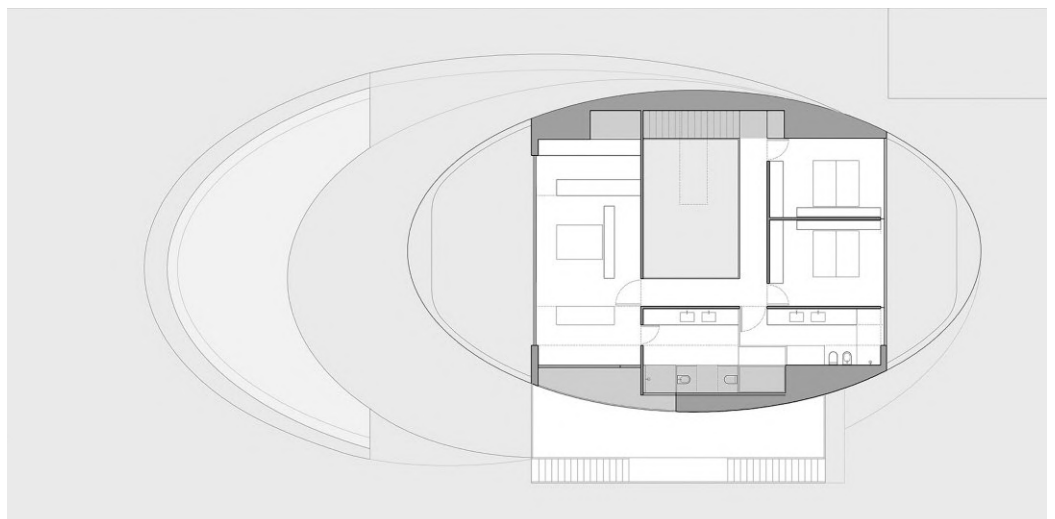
, 4 - Balint House, 2014 (credit: D. Opazo); Plan of the first floor.
